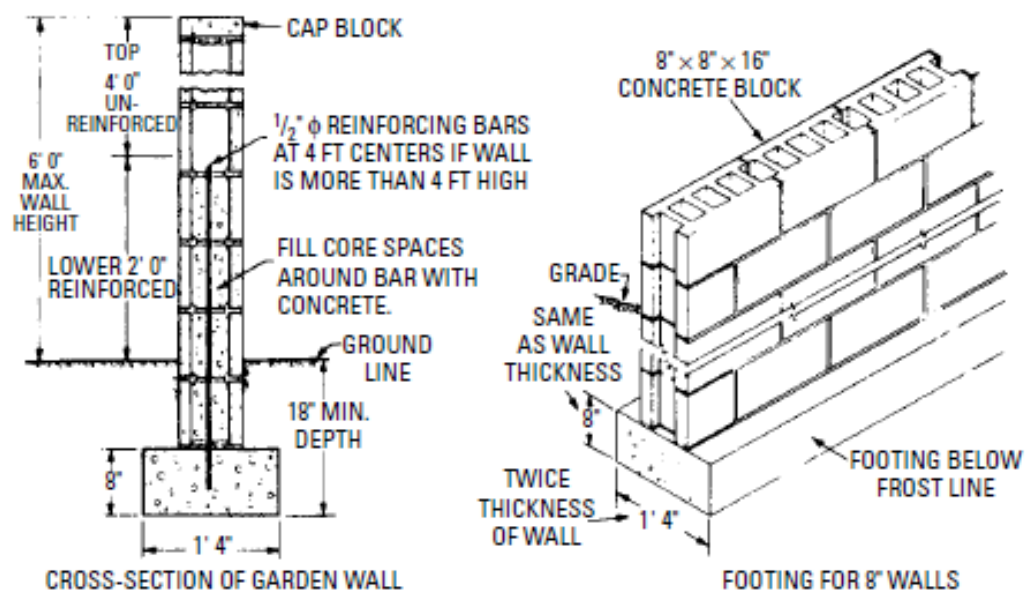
This is a cross-section and view of a simple block wall. Vertical reinforcement rods are placed in the hollow cores at various intervals.
